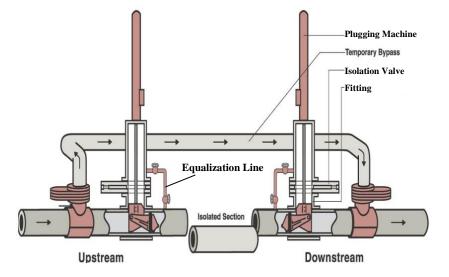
Plugging heads and temporary bypass conduction flow around isolated pipe section
